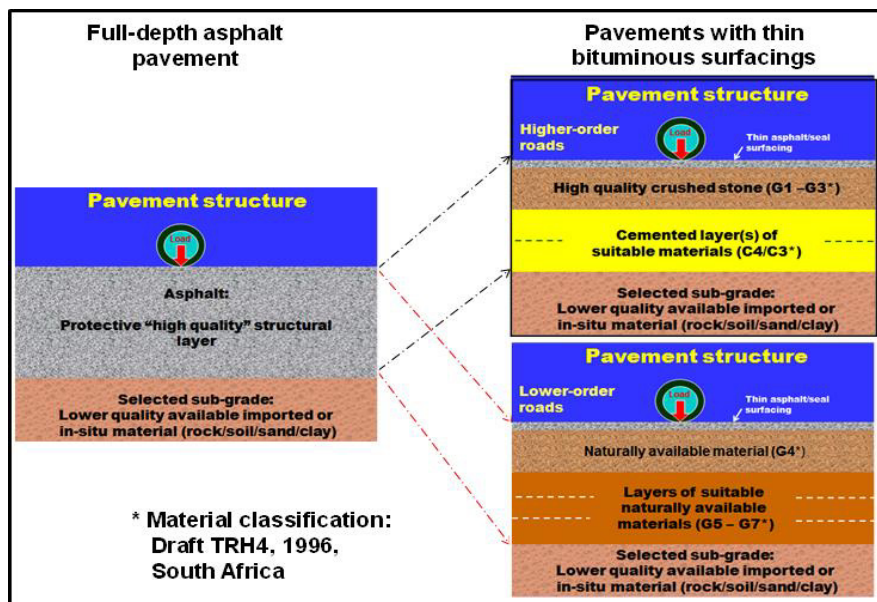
Typical example of full-depth asphalt pavement structure versus pavement structure containing thin surfacings (Jordaan & Steyn, 2019)
